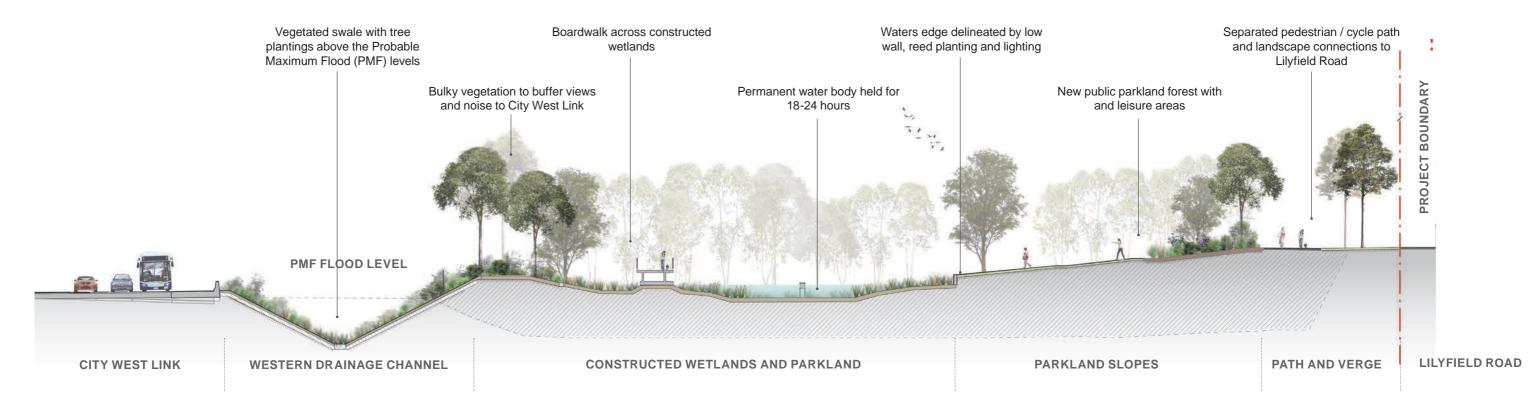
Rozelle Rail Yards - Parkland Forest - typical section
